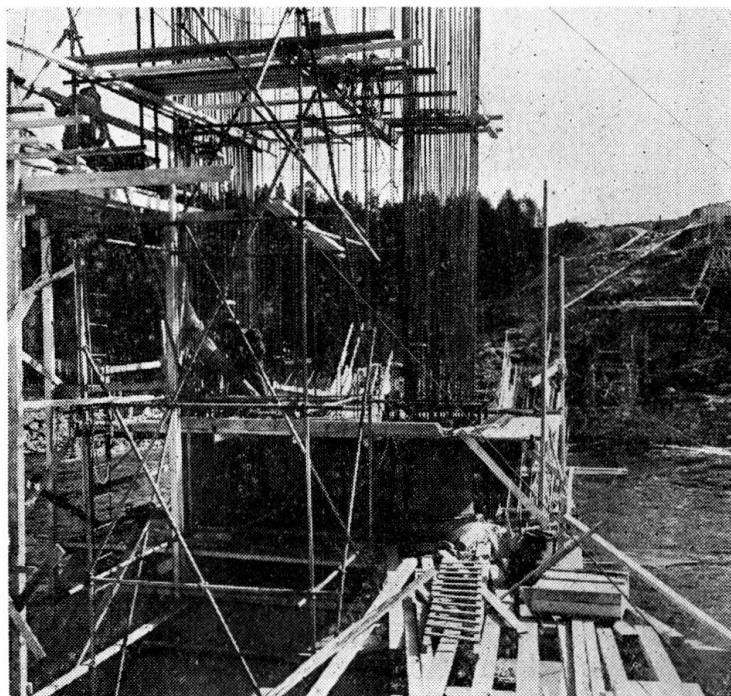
Concreting of an abutment column by means of a sliding form. The raising of the form has recently begun. Photo. Eric Rosenberg
